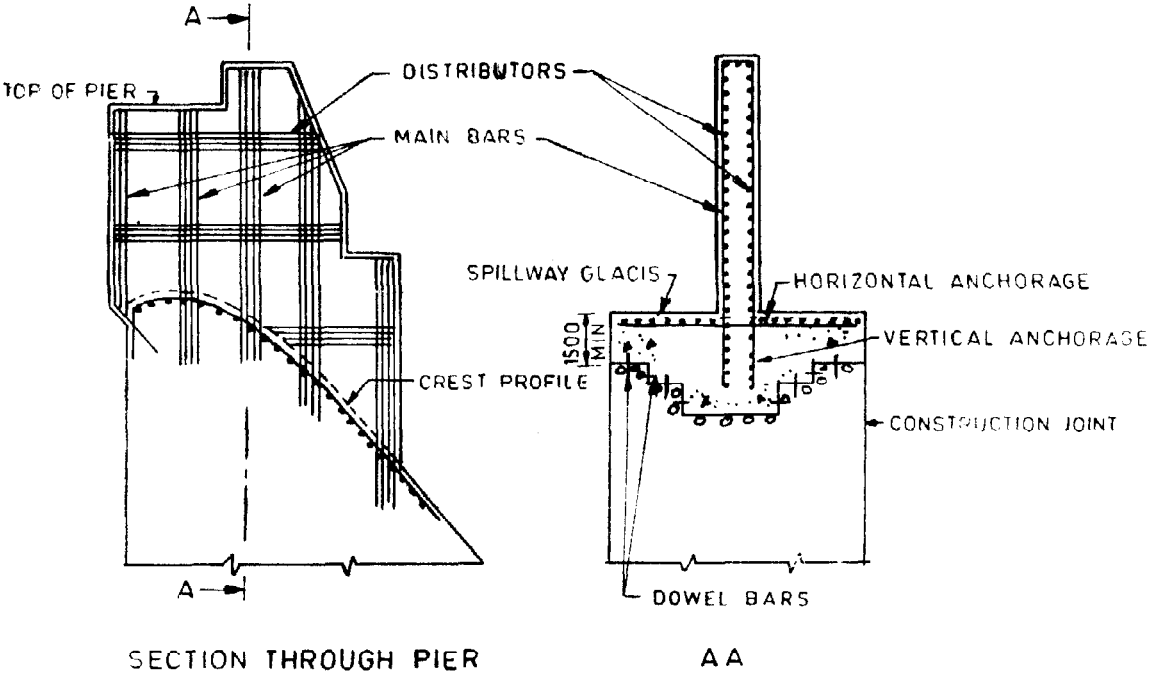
REINFORCEMENT DETAILS FOR INTERMEDIATE PIER
